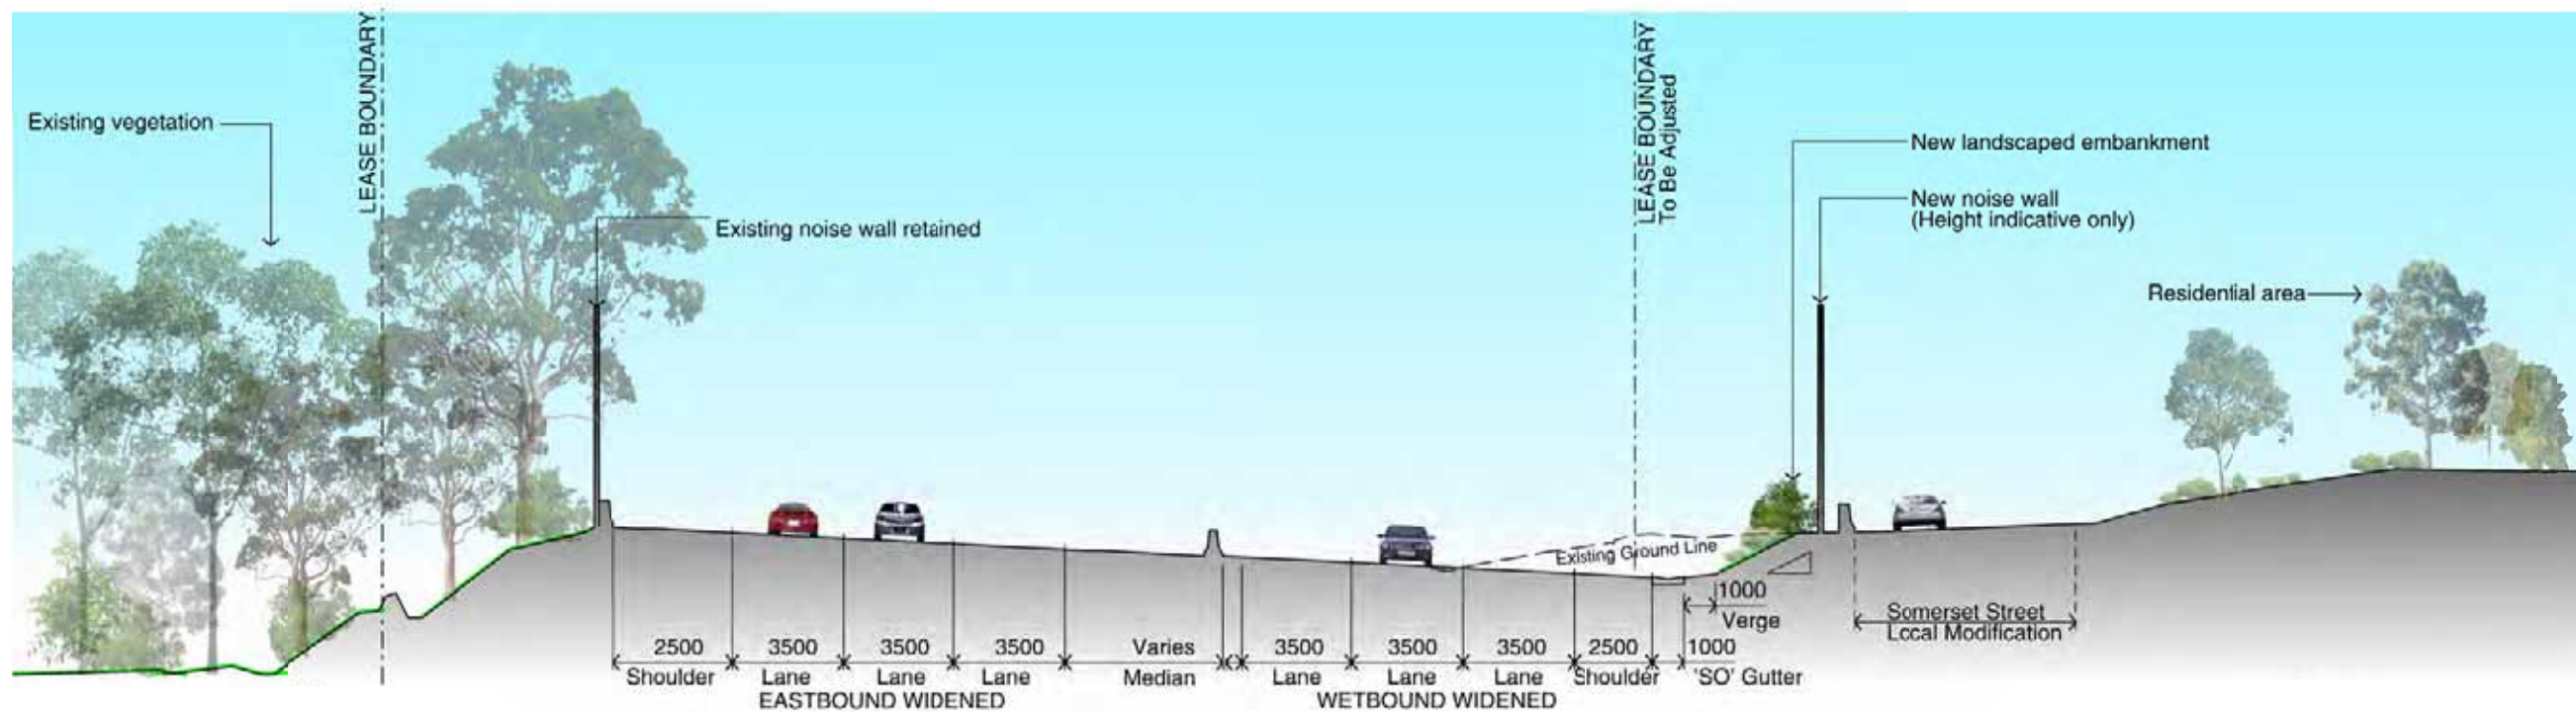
Stn 13350 Somerset Street - Proposed
